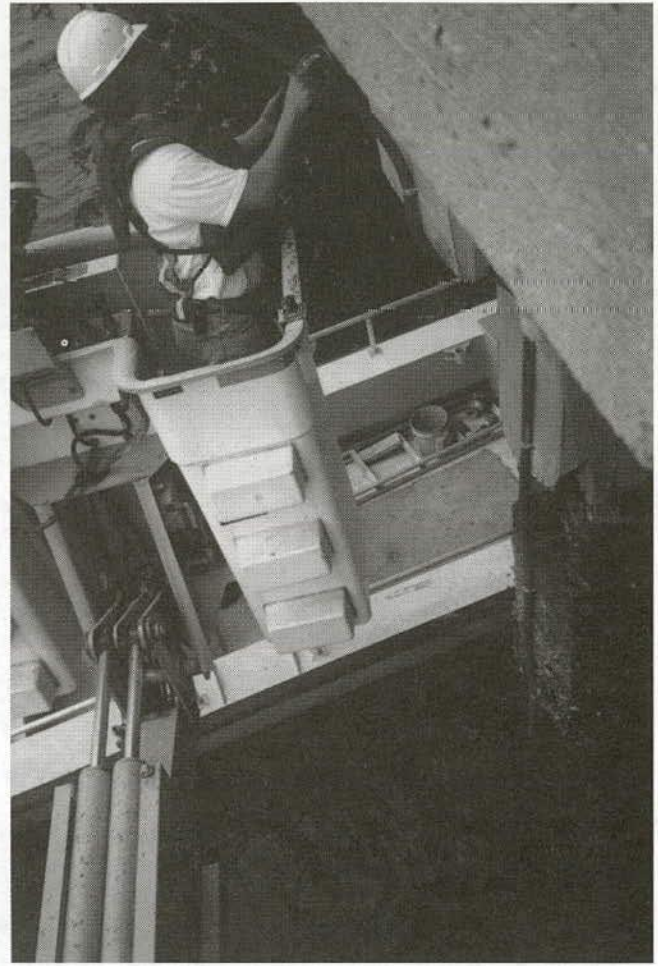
Nassau Sound sliding collar—fastening flexible conduit to bridge pier (Site FL2).
